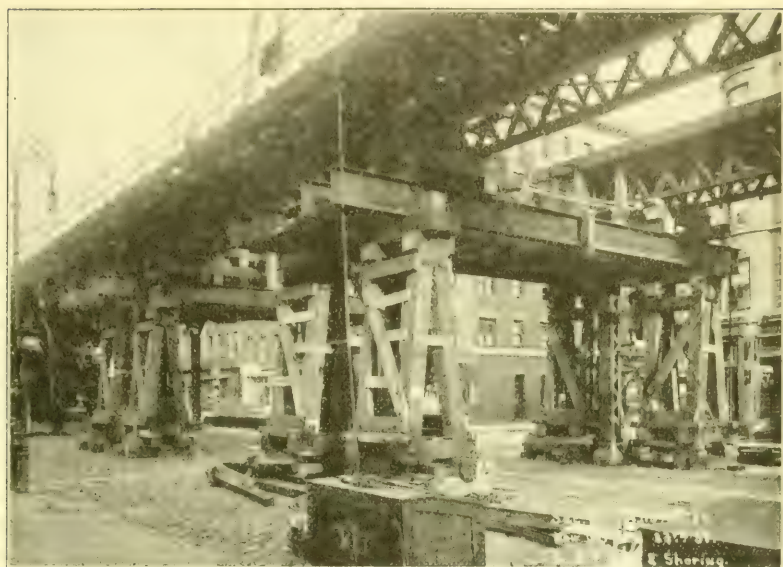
SHORING IN THIRD AVENUE AT 33D STREET.
